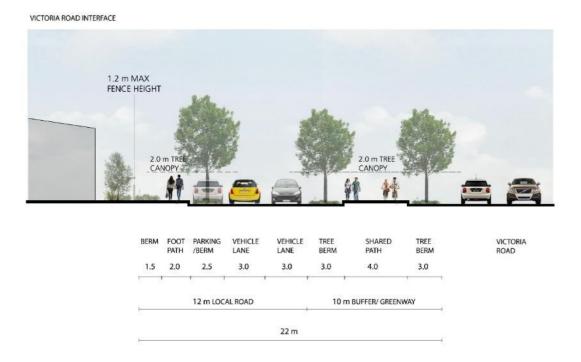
Victoria Road edged by a green walking / cycling connection containing mature street trees to visually narrow the carriageway and provide an attractive entry to Cambridge.
